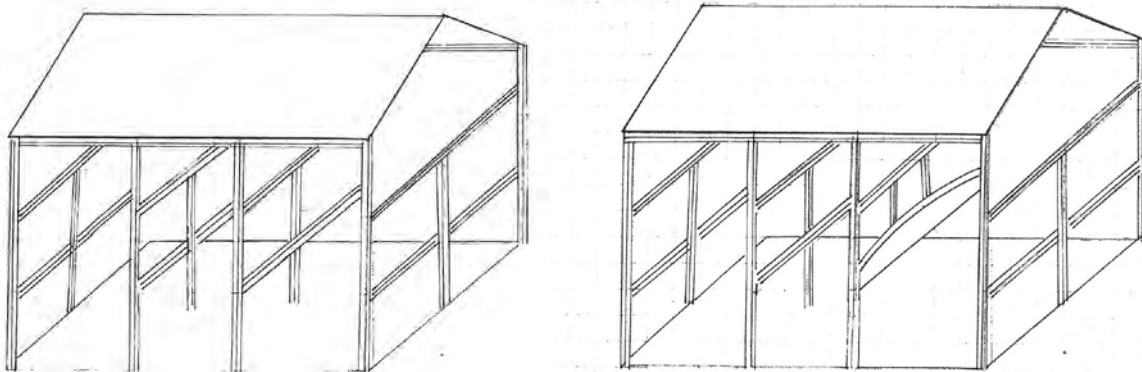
Sketches of typical English barn framing layouts without swing beam (left) and with swing beam (right)
